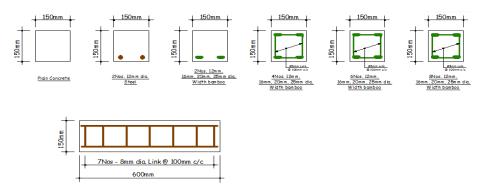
Section Through Reinforced Concrete Beam (Plain, Steel and Bamboos)
